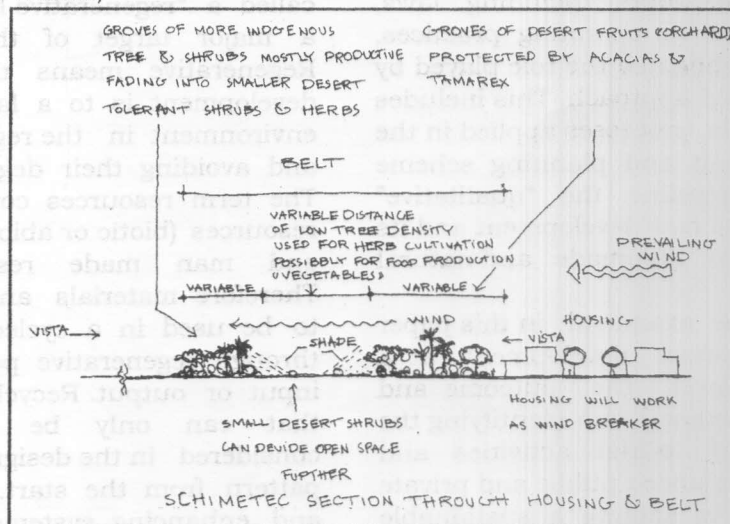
Landscape scheme section through housing plantation belt. Montazah-Sharm center landscape plane.
